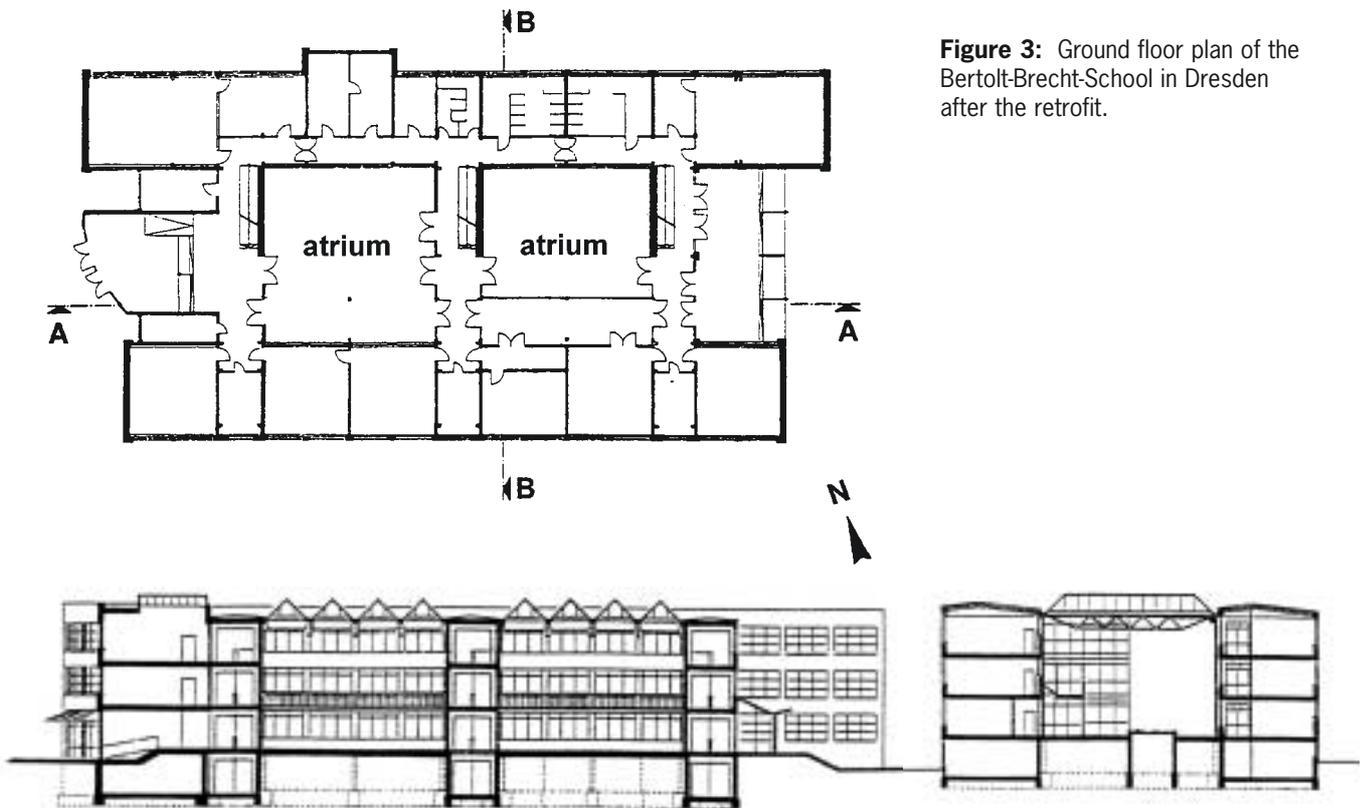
Ground floor plan of the Bertolt-Brecht-School in Dresden after the retrofit.
